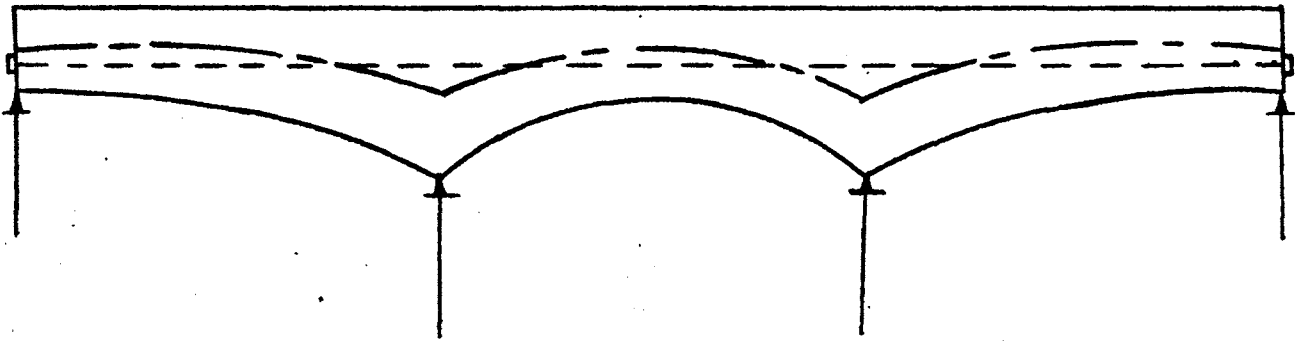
Continuous Prestressed Concrete Beam with Variable Depth and Straight Prestressing Tendon.
